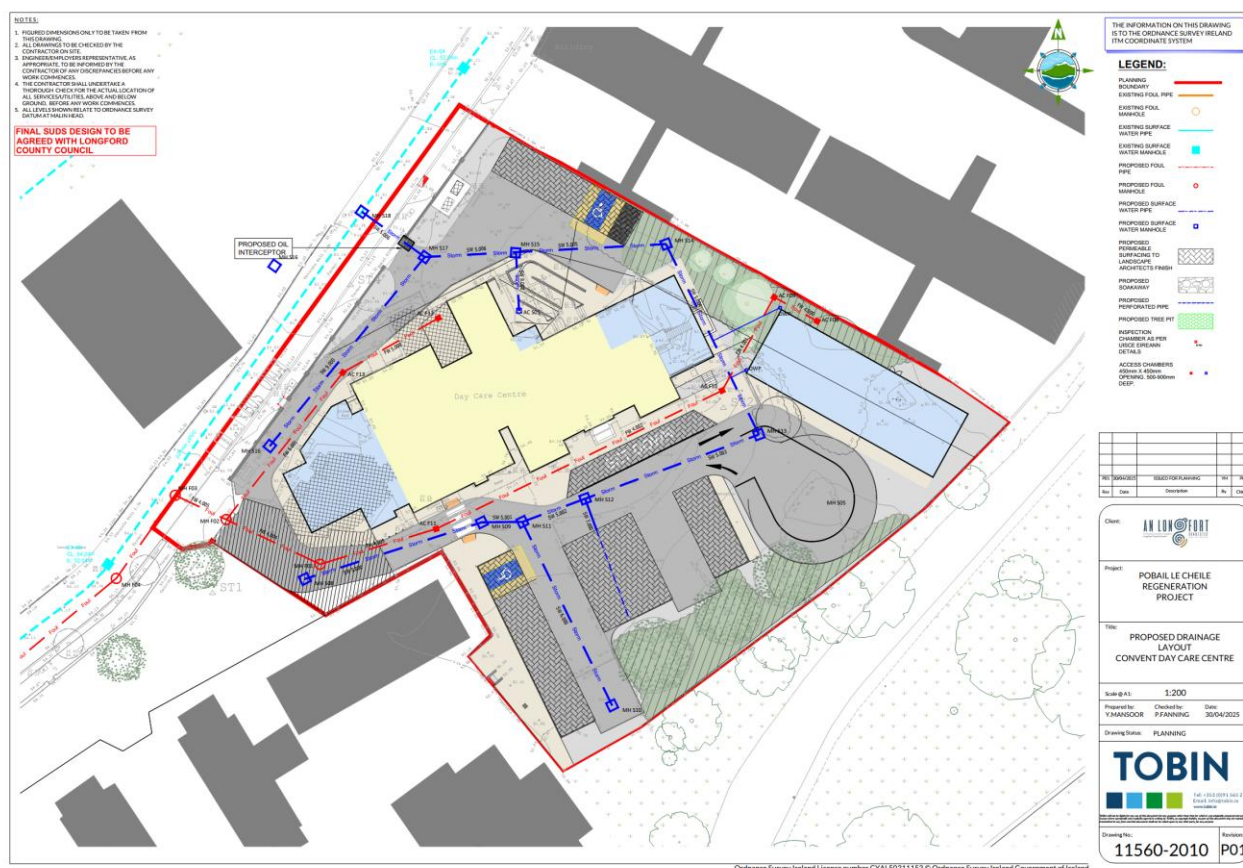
Proposed Convent Drainage, drawing 11560-2010
